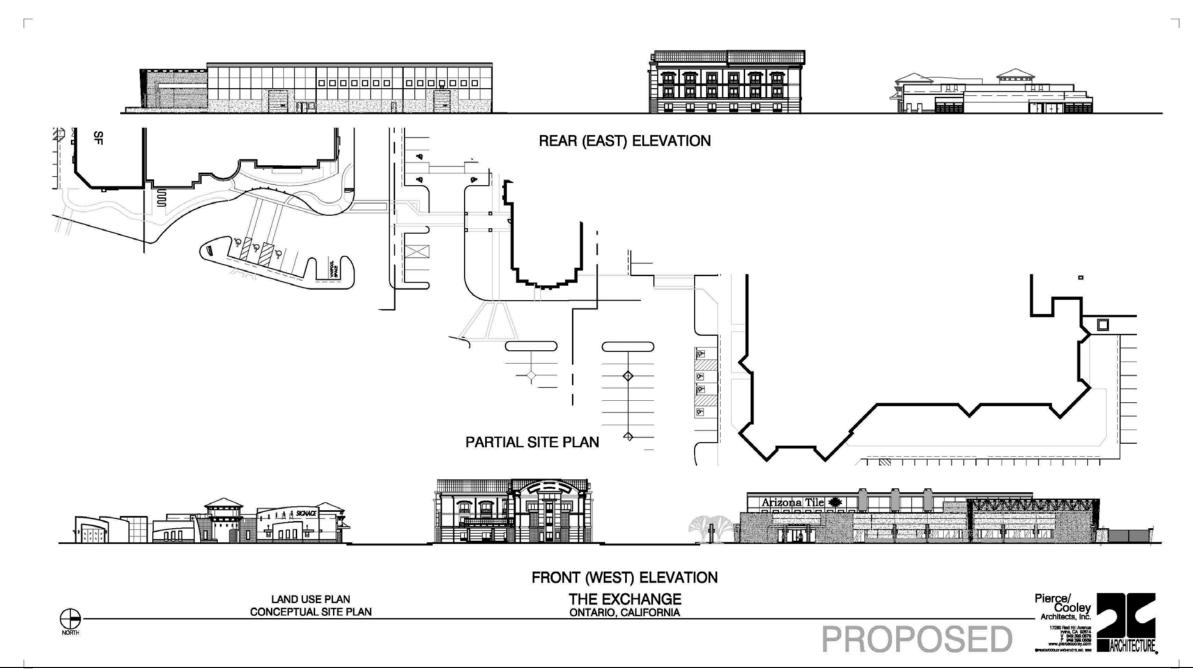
A CONCEPTUAL FREEWAY COMMERCIAL (FC) SITE & LANDSCAPE/ HARDSCAPEPLAN
